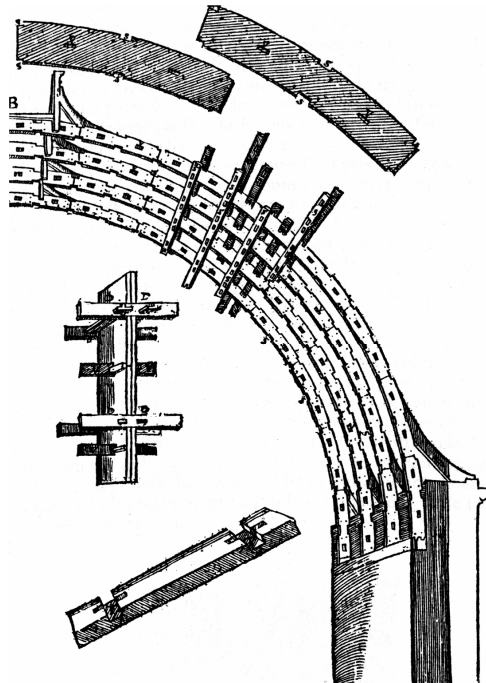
Roof structure of La Muette (de l'Orme 1561, p.293)
